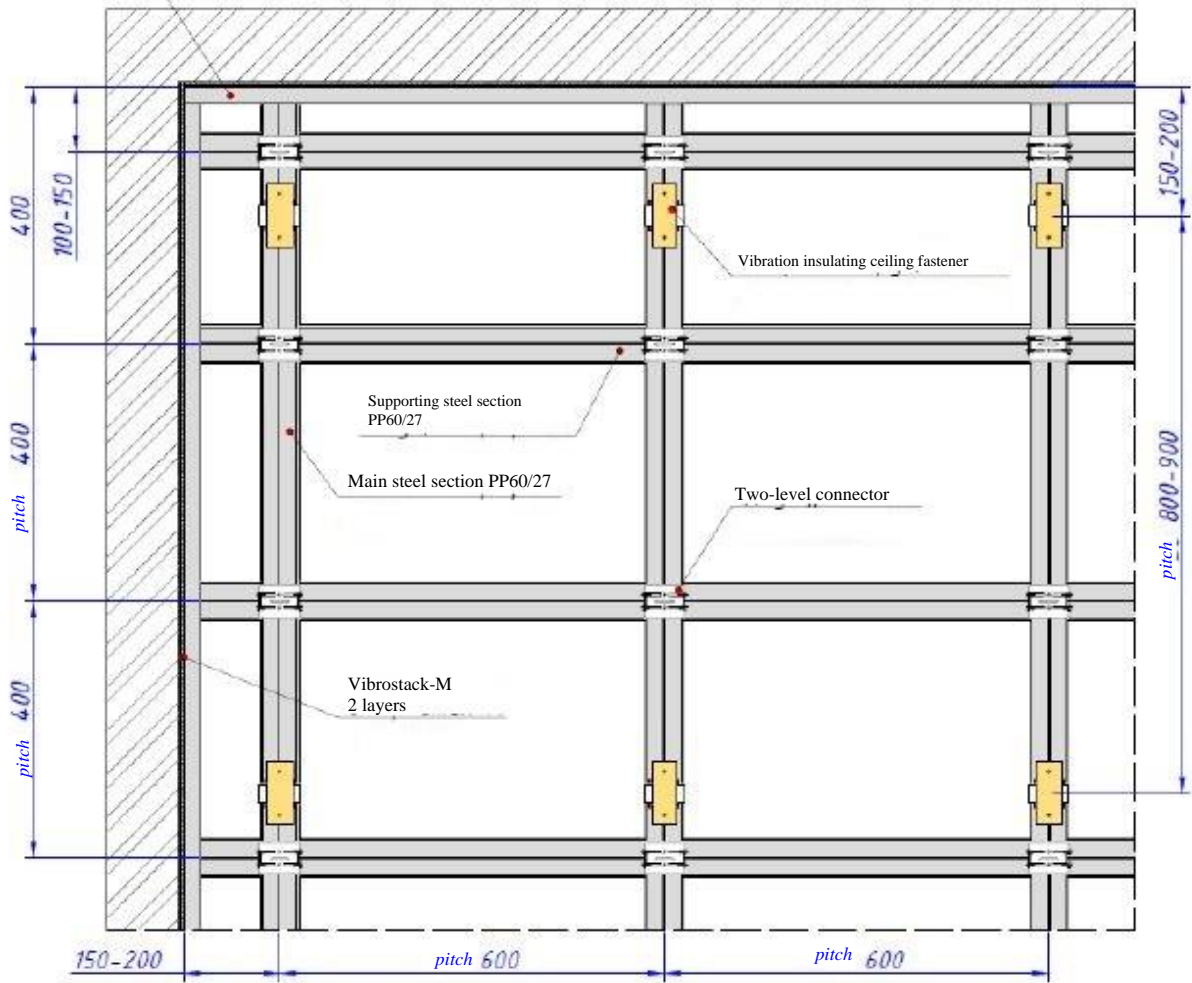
Schematic diagram of framed suspended ceiling installation. Top view.
